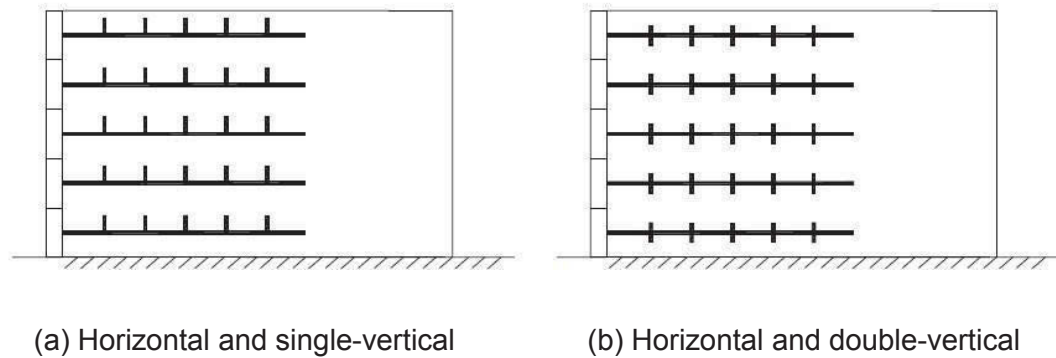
Typical 3D reinforced soil structures (after Zhang, Javadi & Min 2006)
